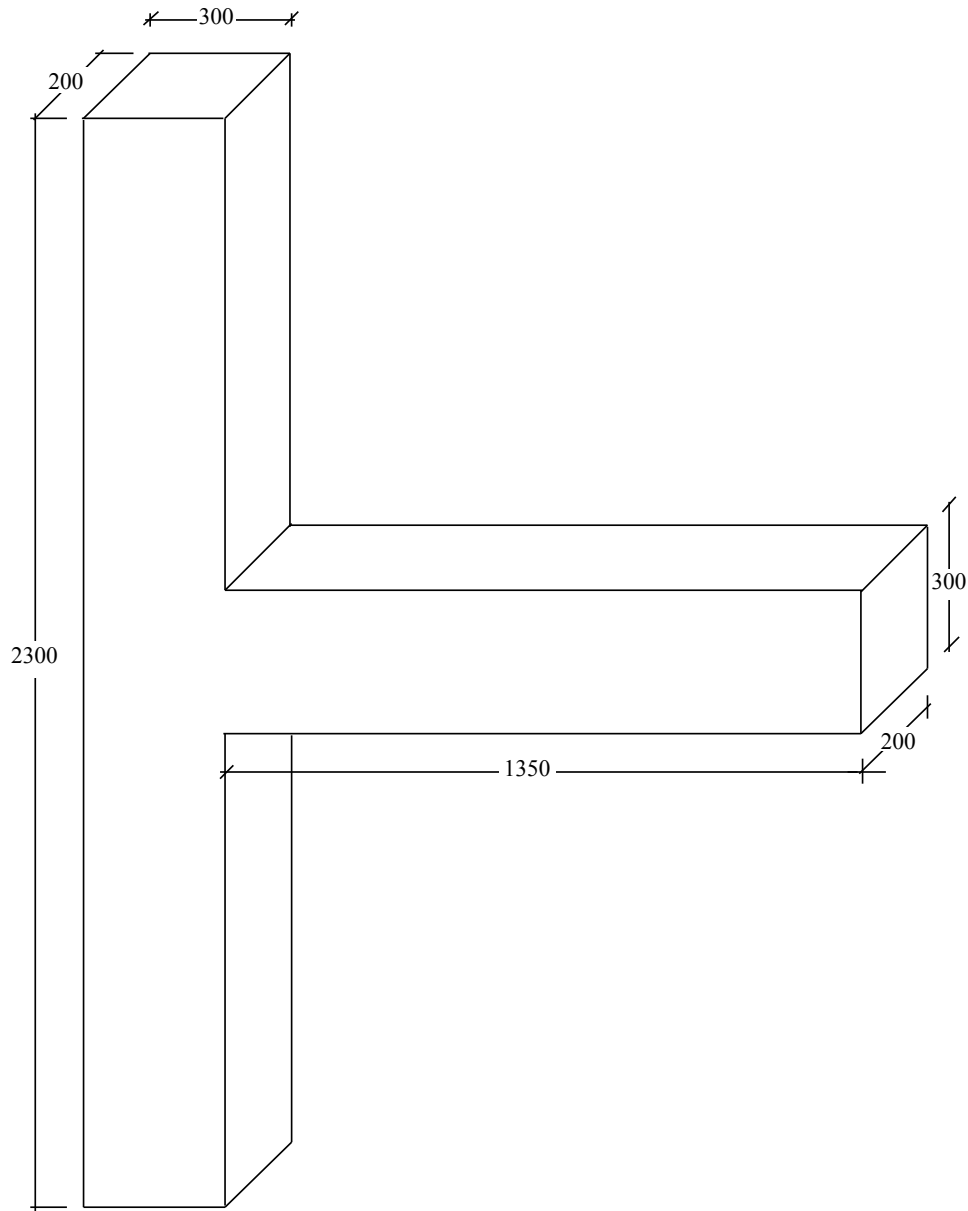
The dimensions of a typical specimen, unit in mm.
